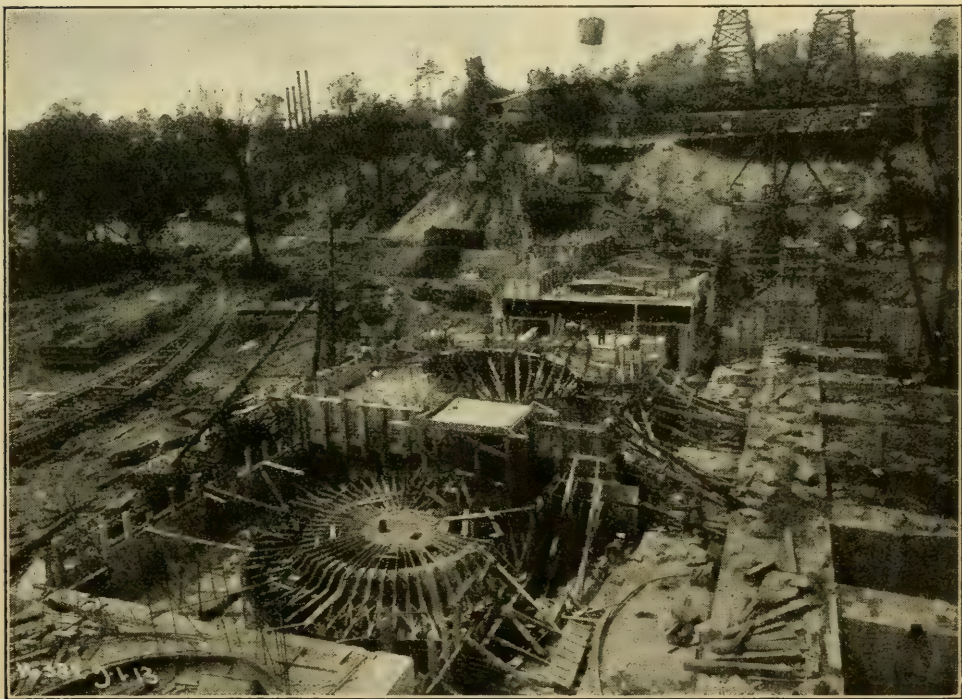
SCROLL CASING FORMS IN PLACE DURING CONCRETING OF FIRST STAGE OF CONSTRUCTION.
